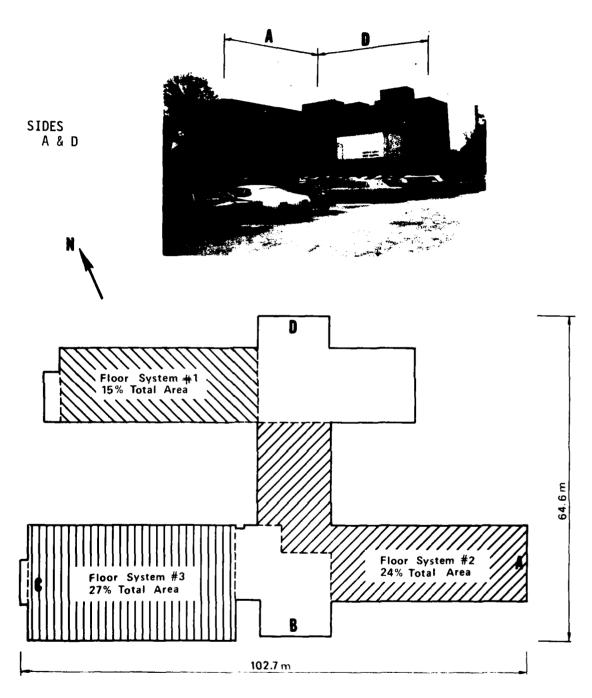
BLDG 110, HENRY R. LANDIS STATE HOSPITAL, Philadelphia, PA - Photograph and Plan of First Floor
